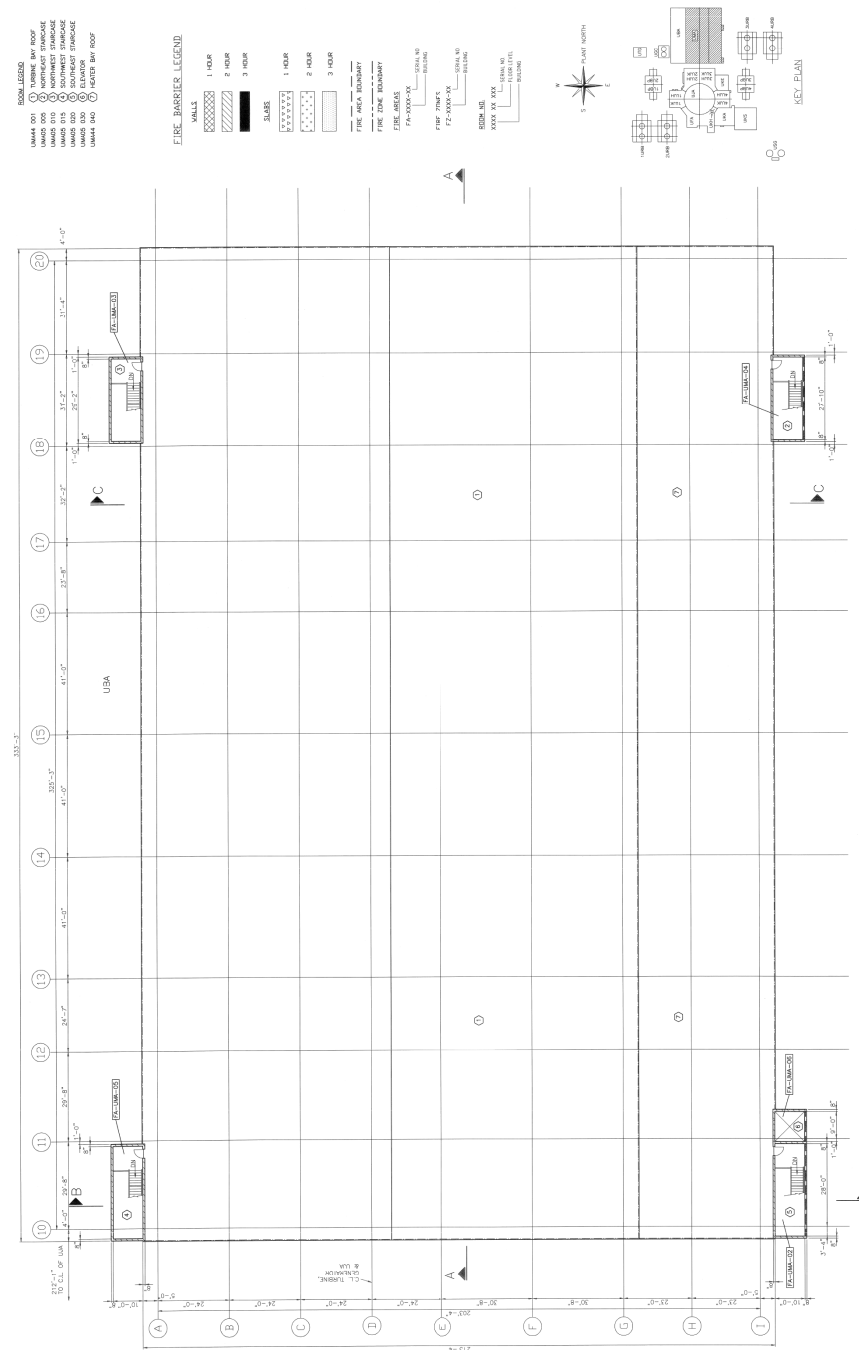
B-7 — {CNPP Unit 3 Fire Barrier Location, Turbine Building Section A-A}
